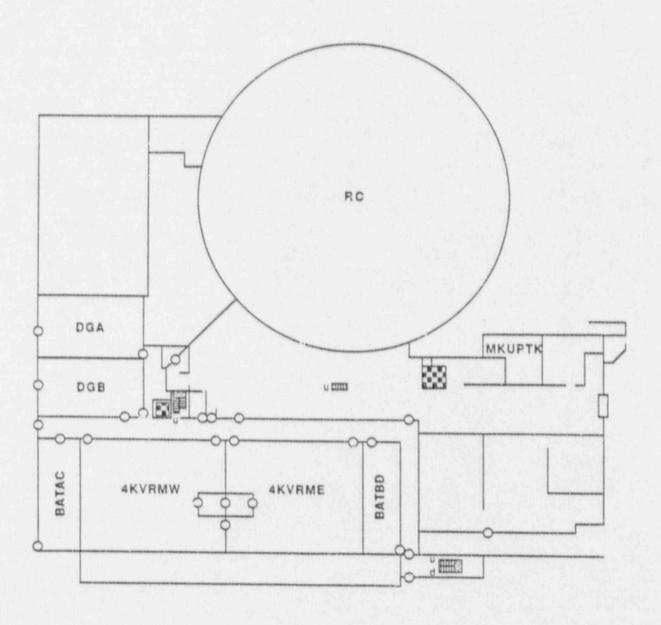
Rancho Seco Containment and Auxiliary Buildings, Elevation 0 ft. (Sea Level)
